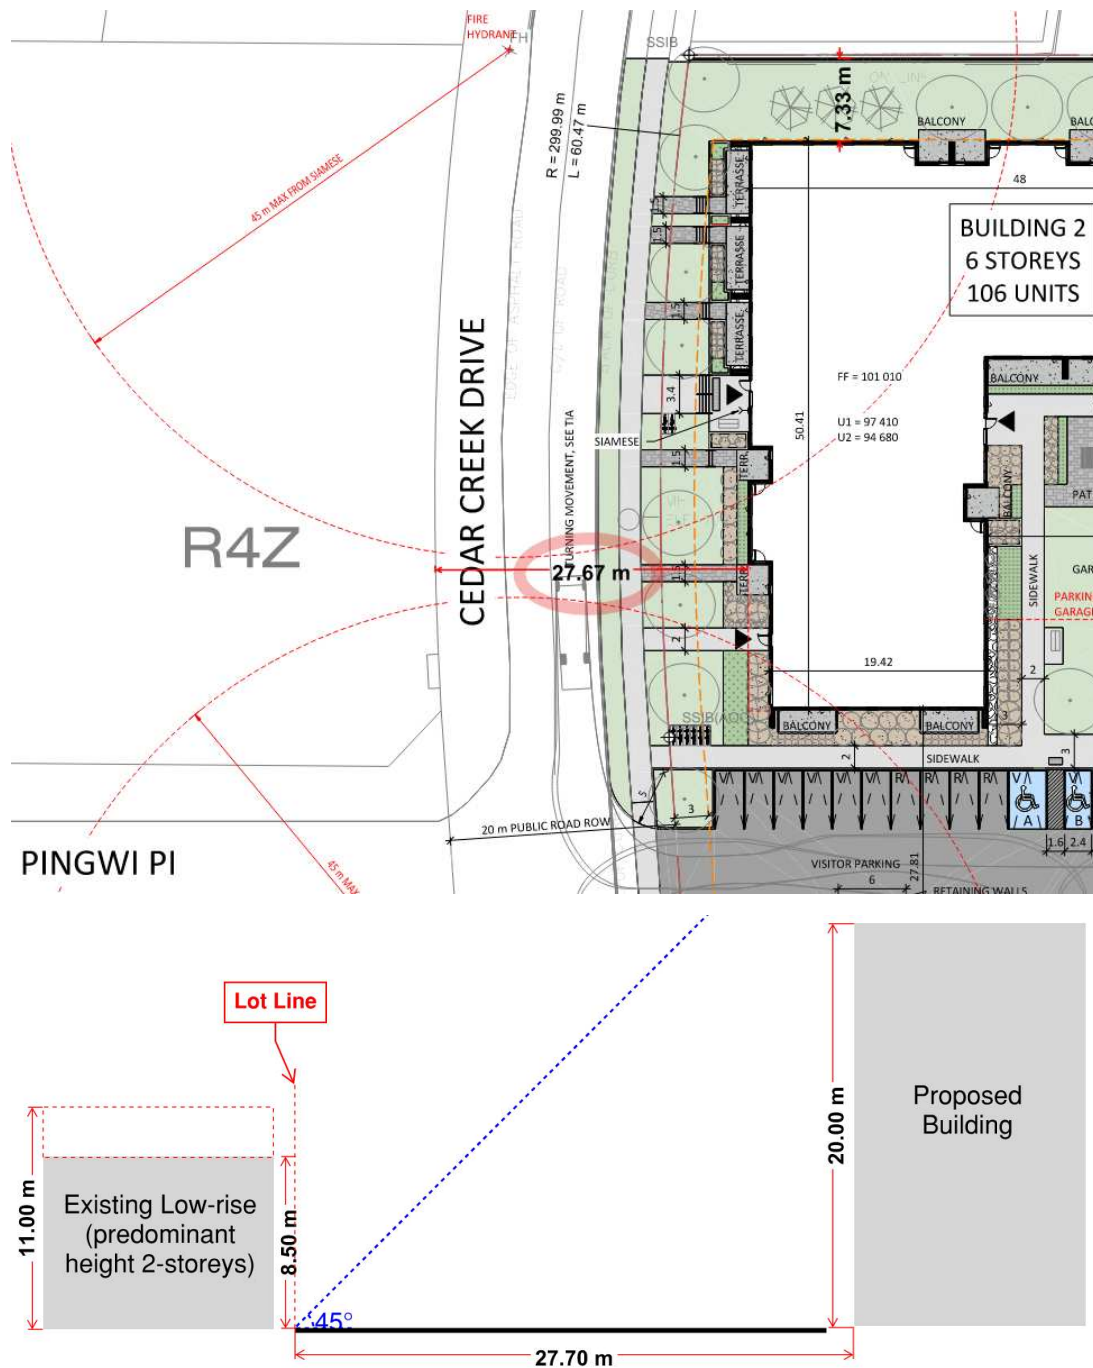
Site Plan Excerpt Building 2) and Angular Plane detail (West)
